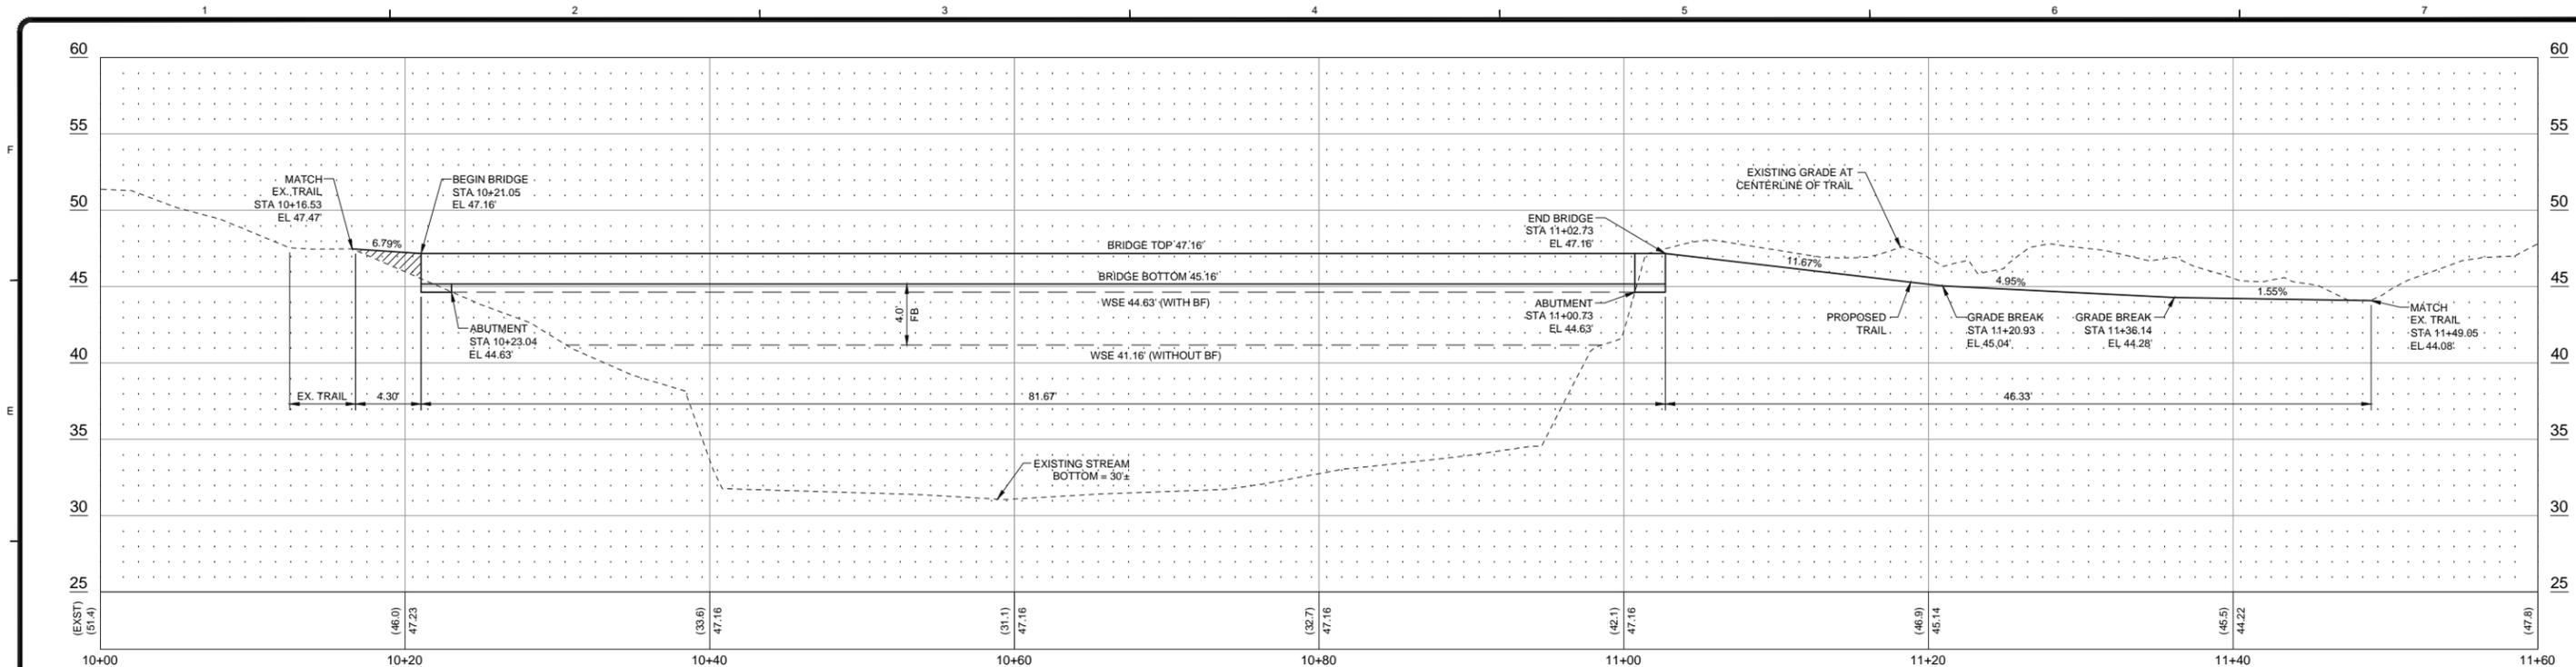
Rendering of approximate proposed bridge structure and alignment.
